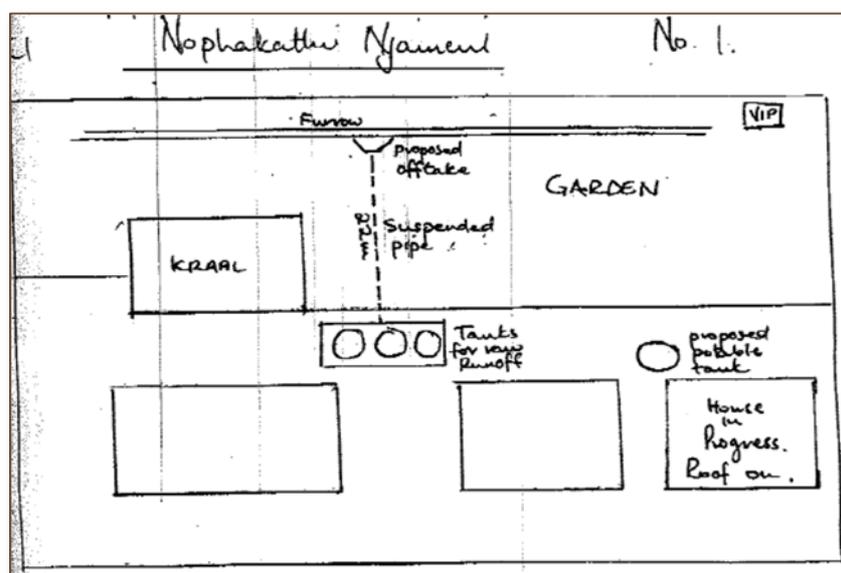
A facilitator's sketch plan of WHC at a homestead.
